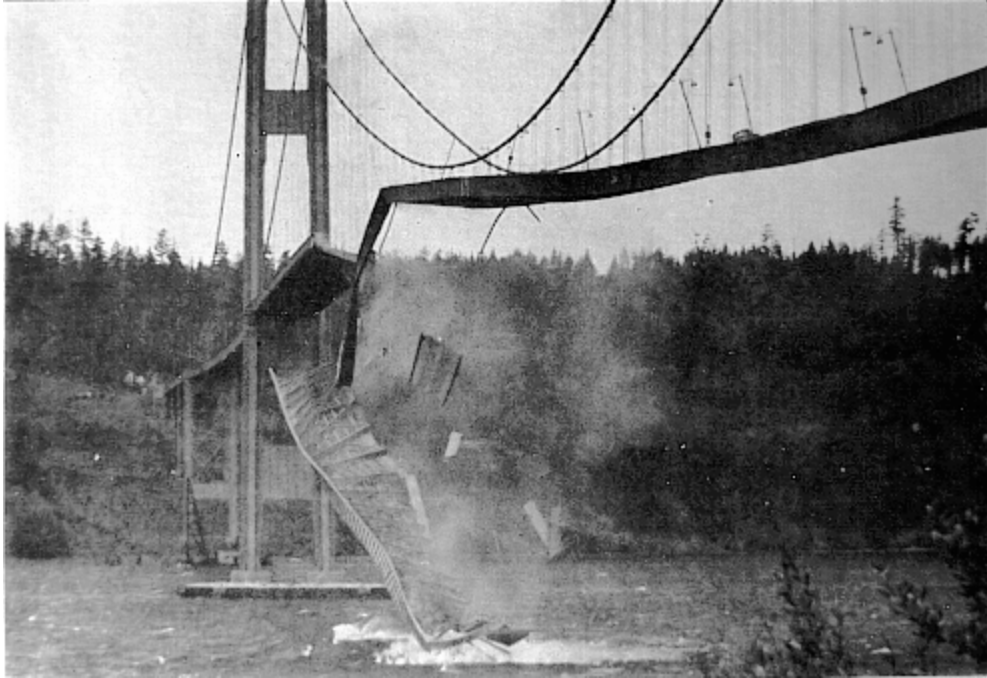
The collapsing Tacoma narrows bridge. Retrieved from: <http://faculty.plattsburgh.edu/margaret.campion/seconded/second/Kent/Kent.html>
